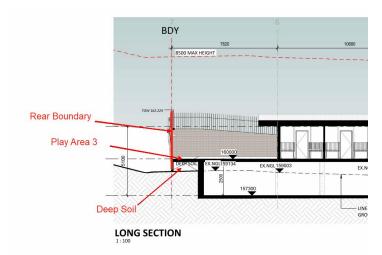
Long Section of Site Showing Deep Soil Under Play Area (Source Audaa Pty Ltd)
